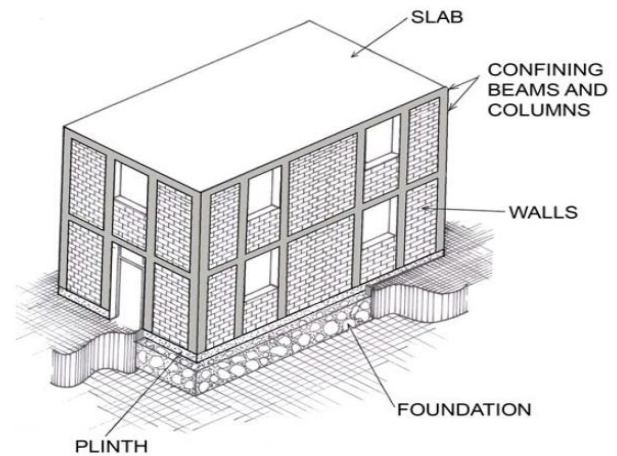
A typical Confined Masonry building of two-story [Blondet,2005]
